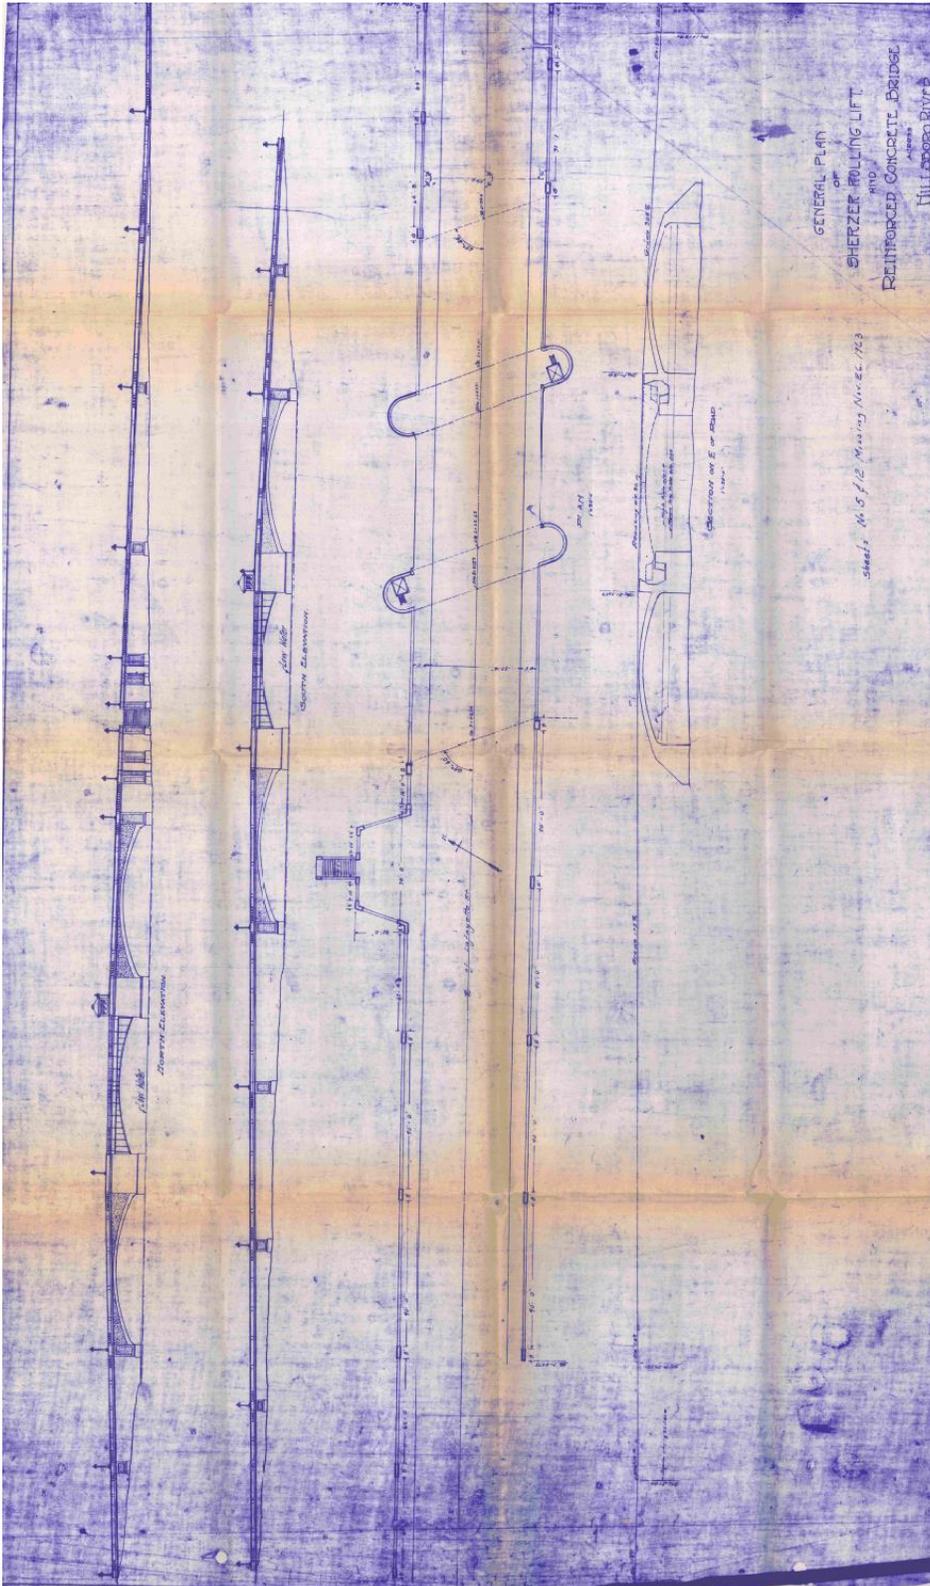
General Plan of the Lafayette St. Bridge., 1912
